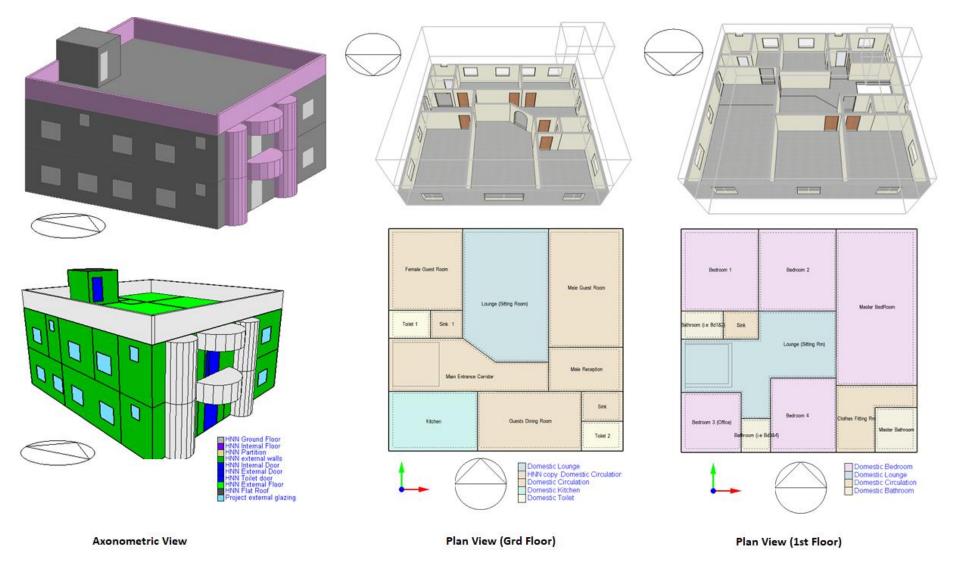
The axonometric and plan view of the modelled building (DesignBuilder)
